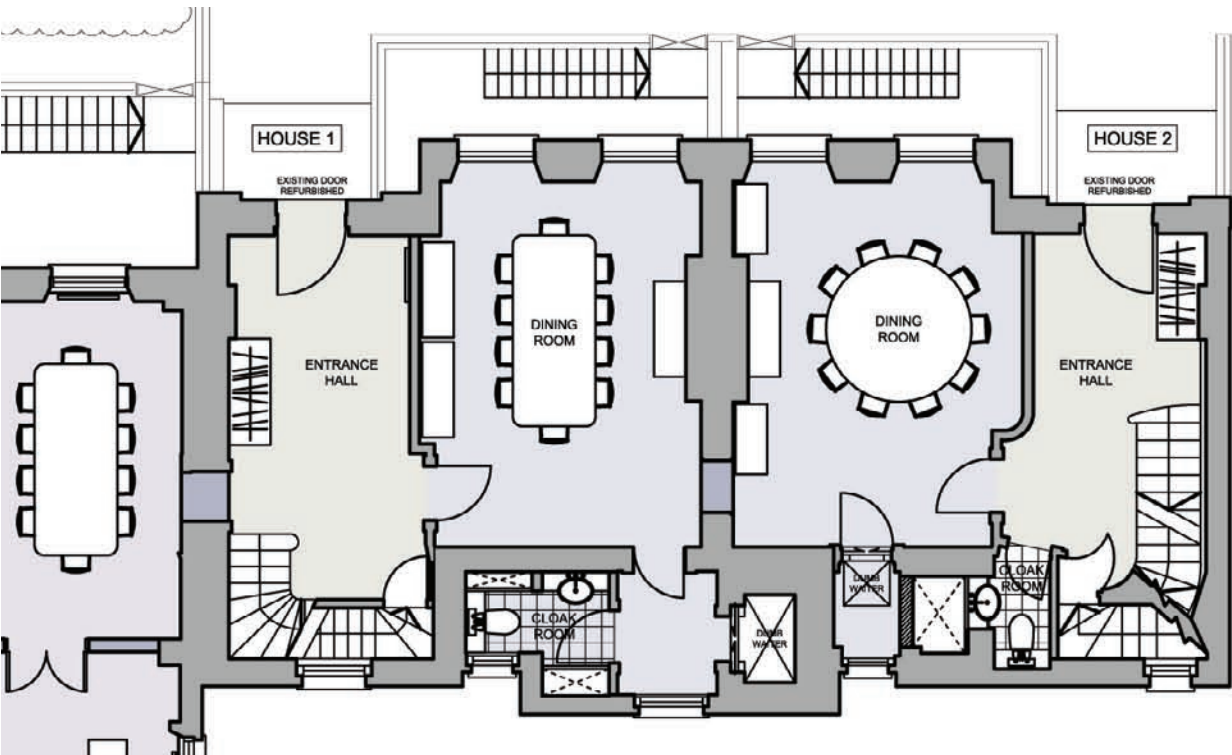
Proposed Ground Floor Layout. 1-2 Chester Gate
